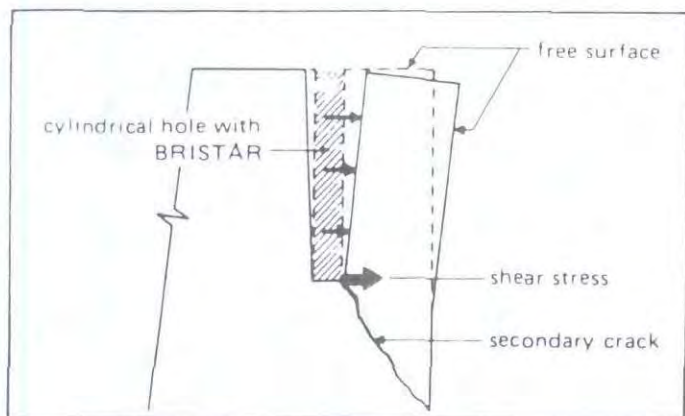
Sectional-view of the crack formation in the material with two free surfaces
